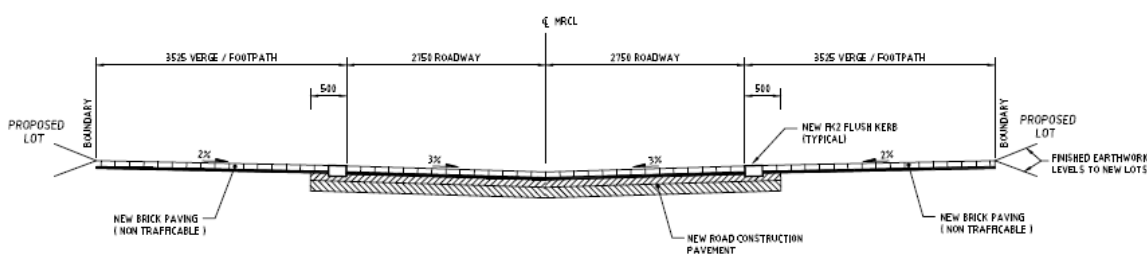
TYPICAL CROSSSECTION – URBAN RESIDENTIAL AREAS
